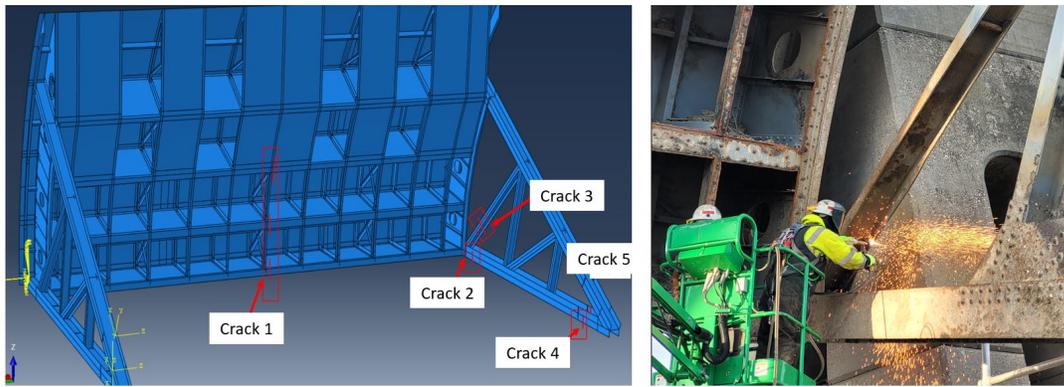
(left) location of cracks (right) process of cutting crack 3, to completely fracture truss diagonal
